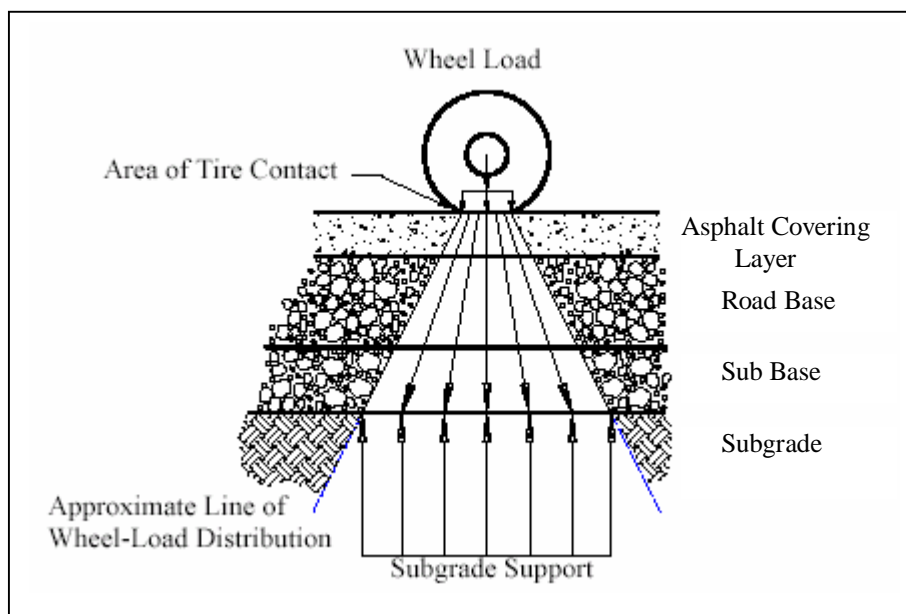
Distribution of Load Stresses in Flexible Pavements.
